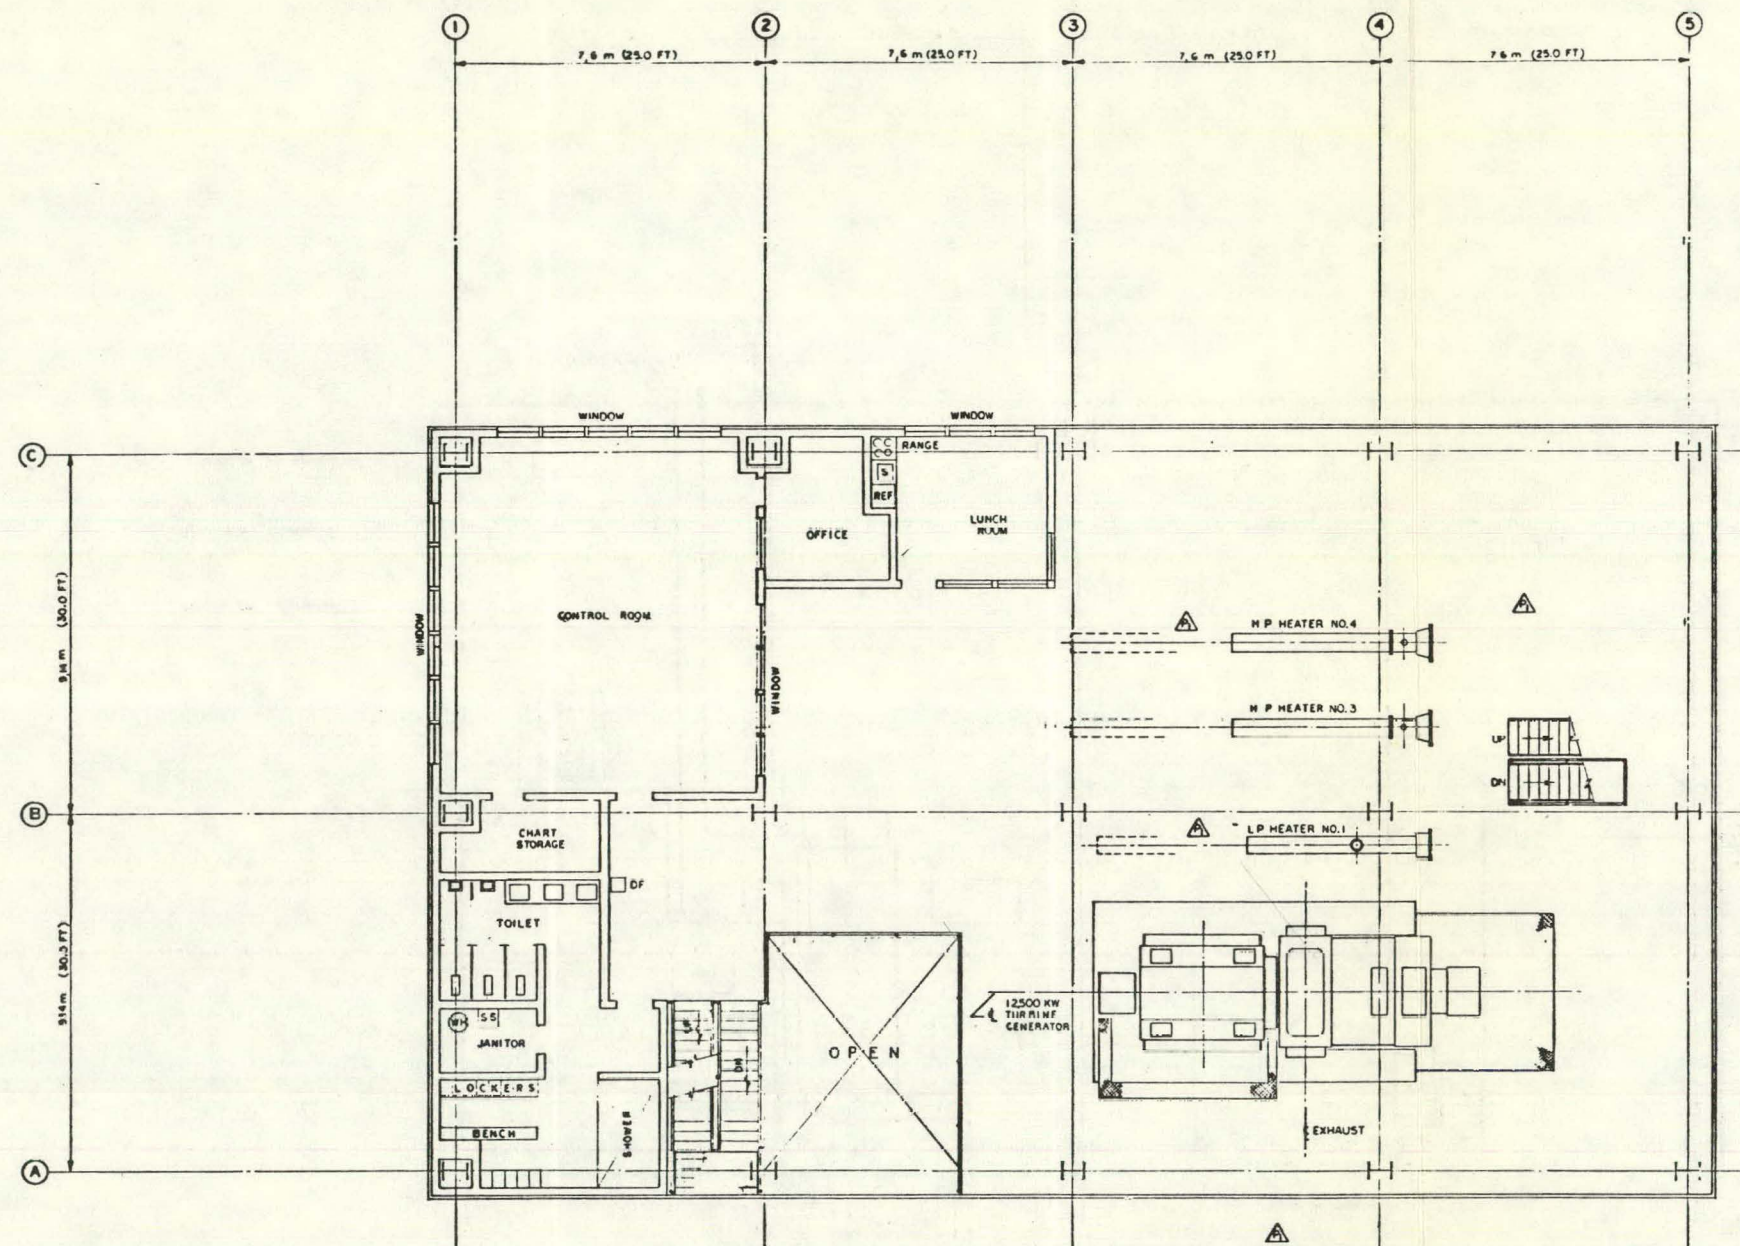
Pilot Plant General Arrangement -- Ground Floor, EPGS
